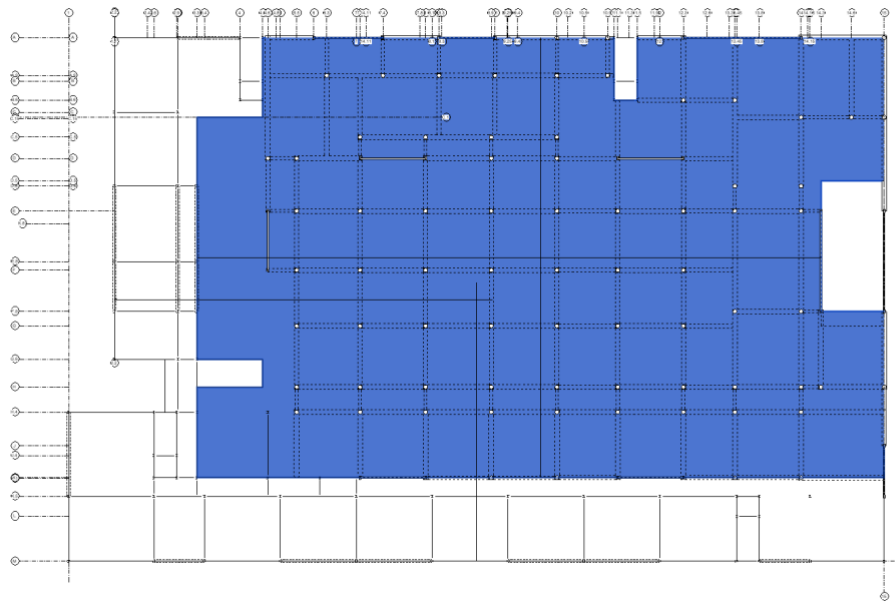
Final Level 1 Parking Garage Layout from Studio TSquare (Parking garage highlighted in blue).
